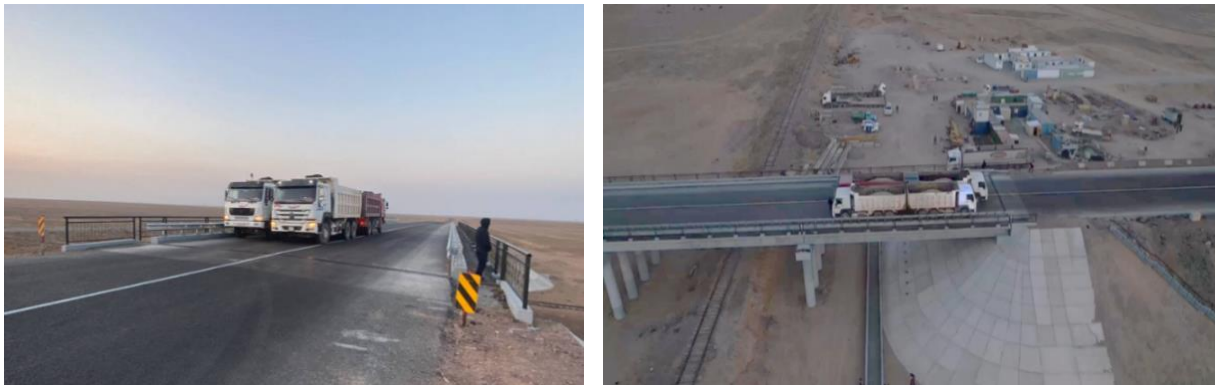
View of the bridge roadway with test loads in the form of loaded vehicles (the second loading scheme).
